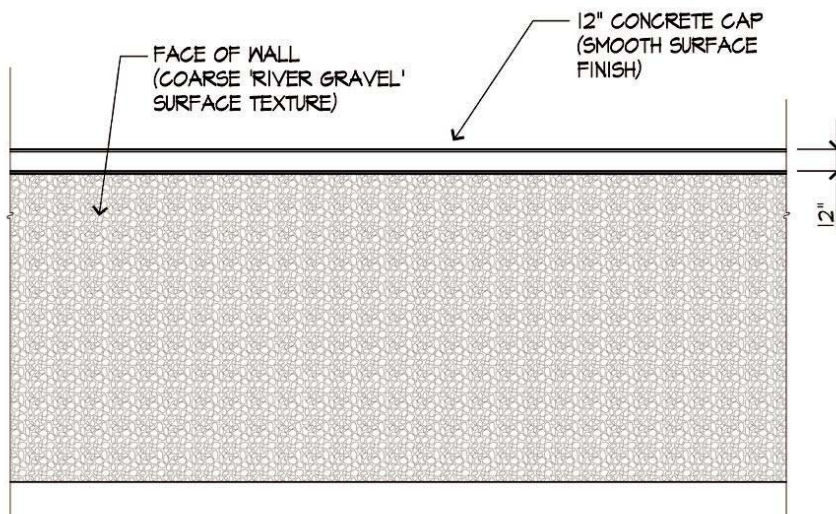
Elevation of Concrete Retaining Wall Showing SR 509 Corridor Finishes.
